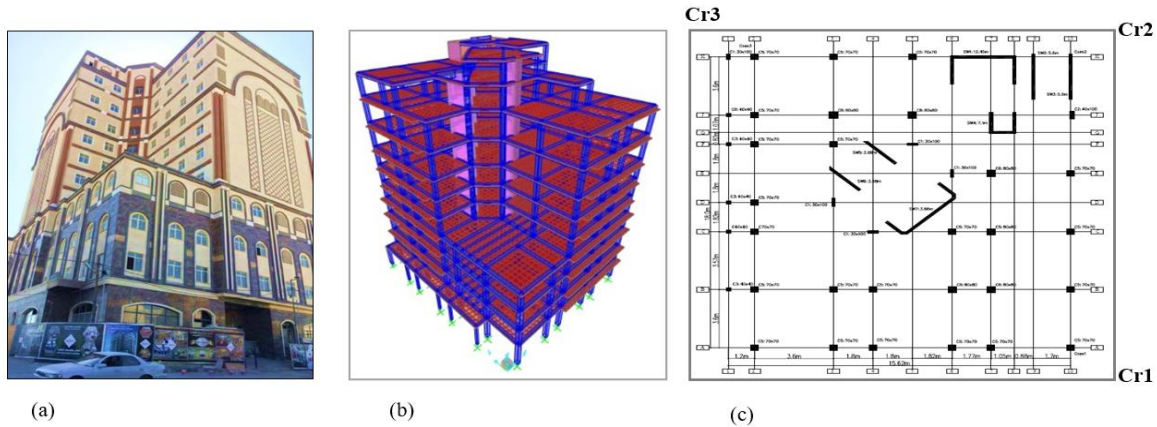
(a) the perspective view of the building (b) the 3D model, (c) the plan of the ground floor
